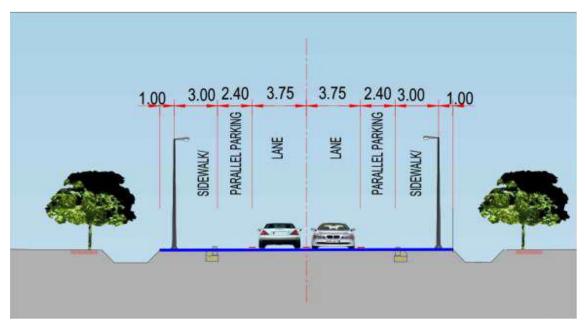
Igoma-Buhongwa Road - Road cross section with parallel parking
